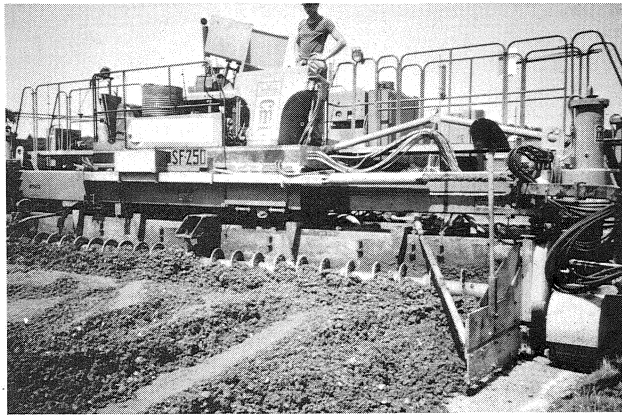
R.N. 6 overlay (1985) : Slip form machine
